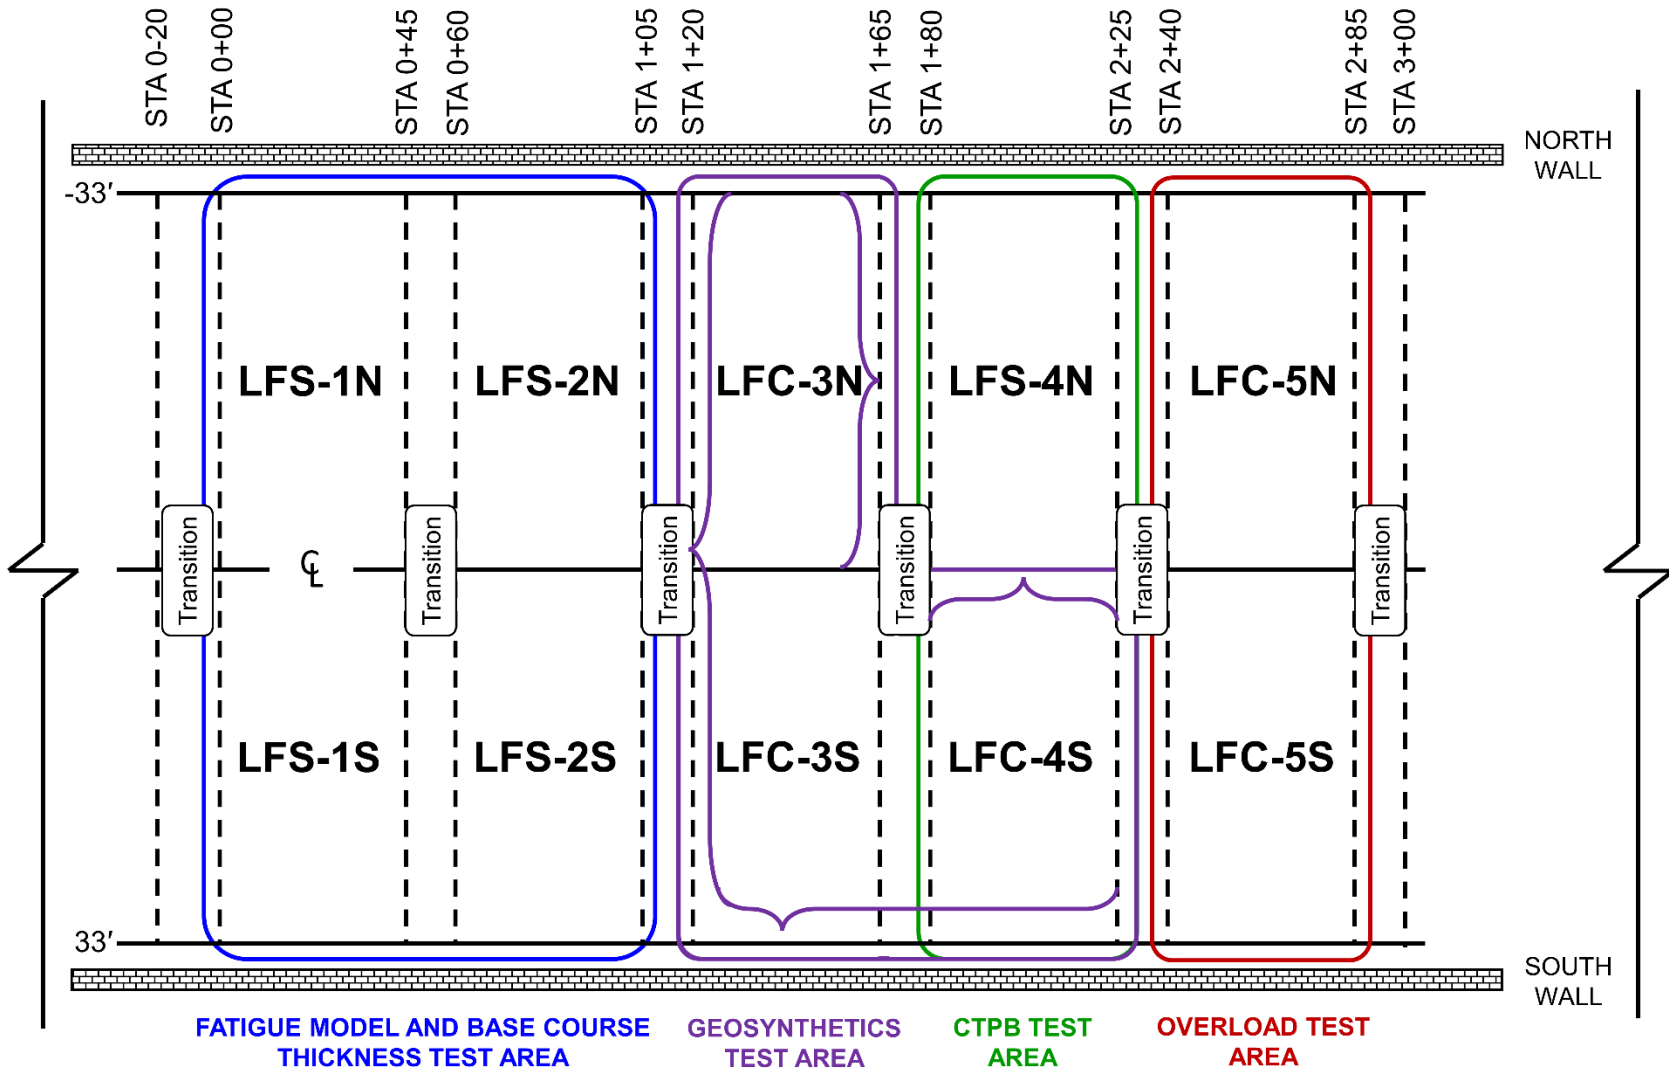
Plan View of the Construction Cycle 9 Test Areas and Items
